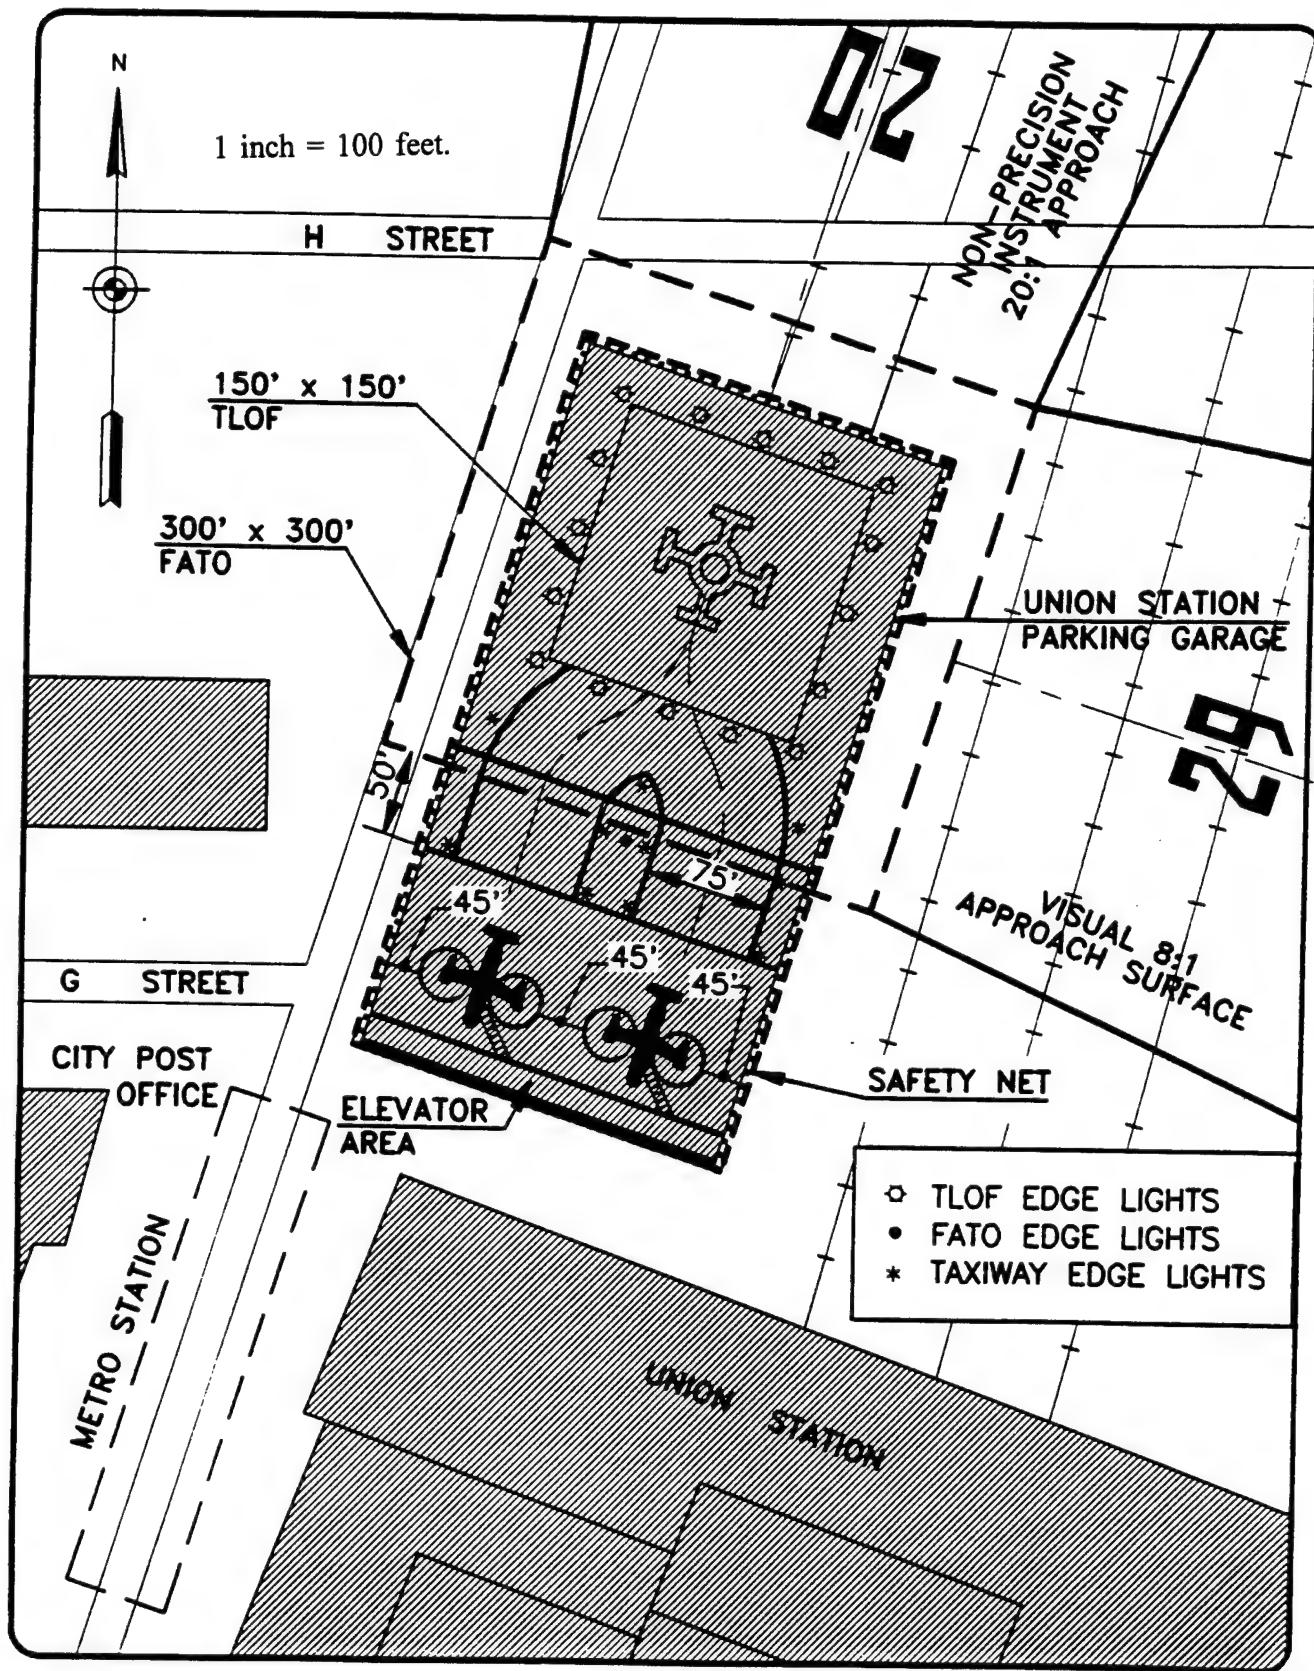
SITE PLAN - UNION STATION, WASHINGTON, D.C.
